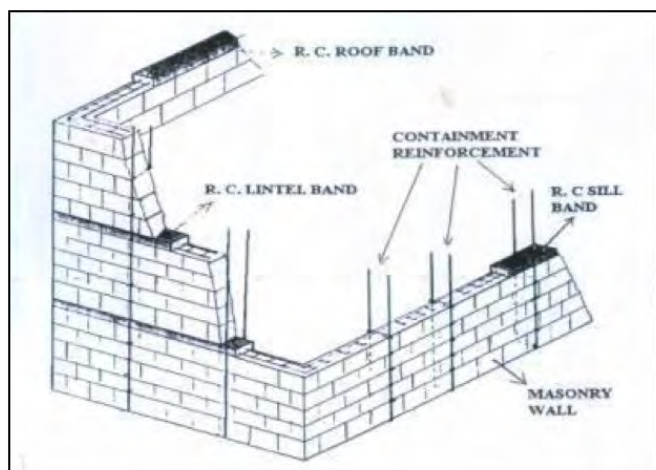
Schematic diagram of building model with seismic bands and vertical containment reinforcement
